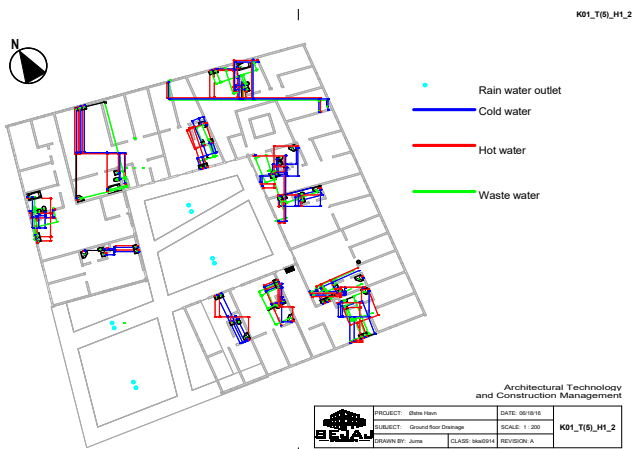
Water Supply and Drainage Plans: Ground Floor
